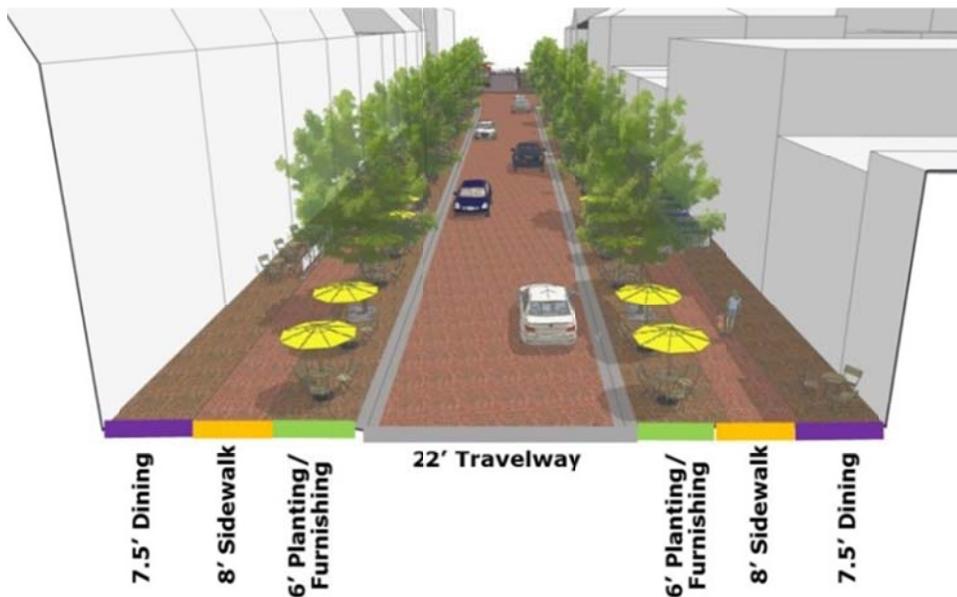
Typical Section of Option 2 - Widened Sidewalks/No Parking
